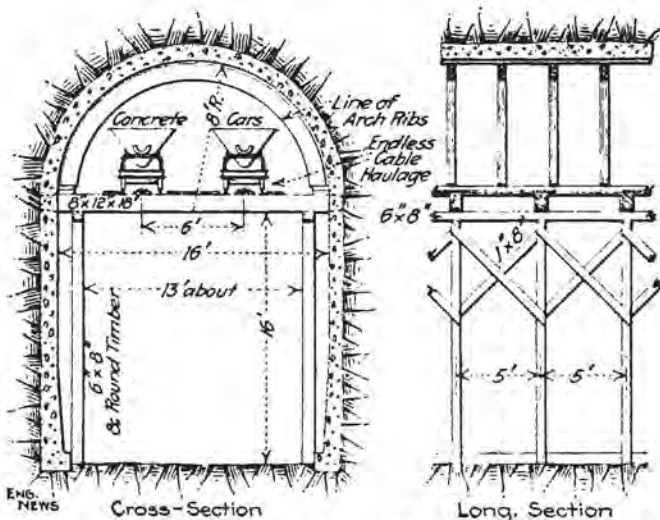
TIMBERING TO CARRY NARROW-GAGE TRACKS FOR CONCRETING THE TUNNEL (ENDLESS-CABLE HAULAGE SYSTEM)
